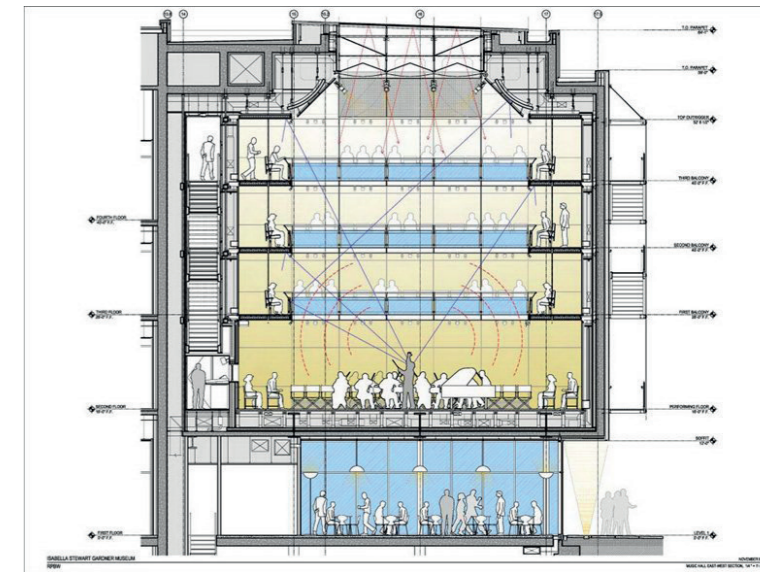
Calderwood Hall building section. Drawing from Renzo Piano Building Workshop
